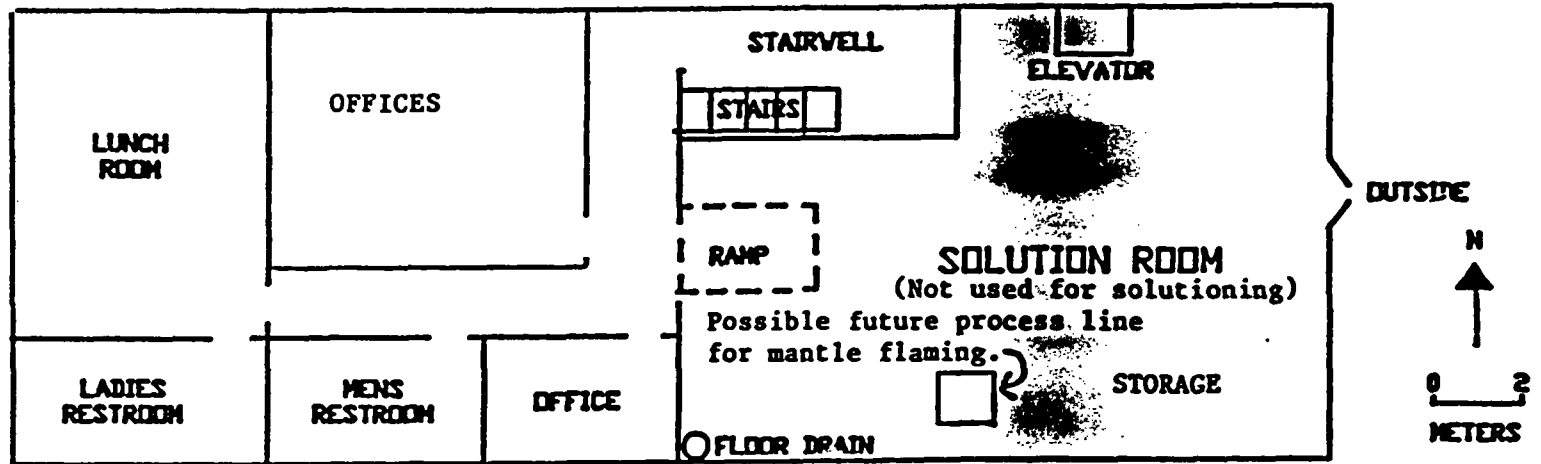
Floor Plan of the Sunflame Appliances Facility Main (First) Floor.
